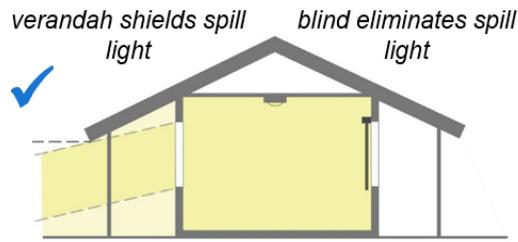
Design solutions to minimise interior spill light above horizontal plane
